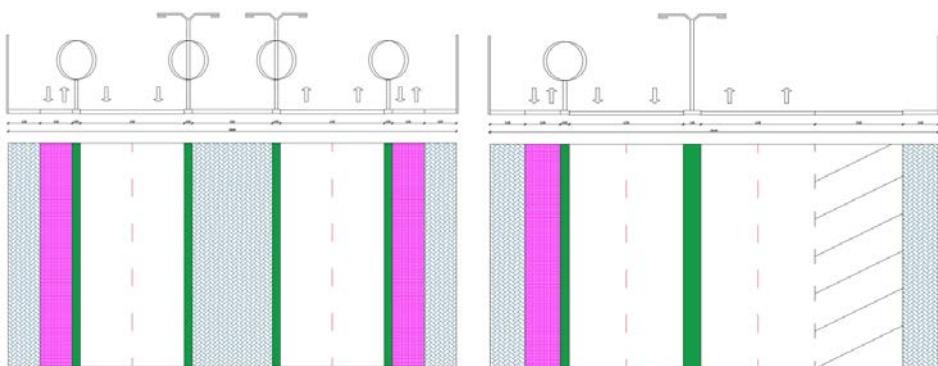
Geometric cross sections of streets Bulevar patrijarha Pavla (left)
